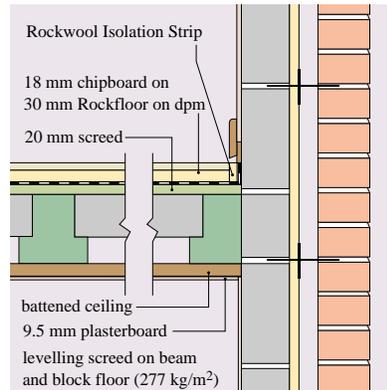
Beam and block floor using Rockwool Rockfloor on levelling screed
